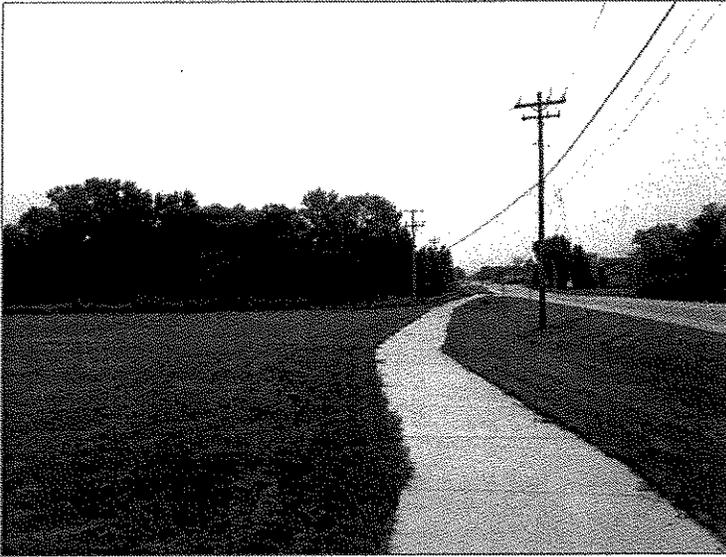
Standing at southeast intersection of S. 51<sup>st</sup> Street and W. Drexel Avenue looking south towards proposed mitigation area.
